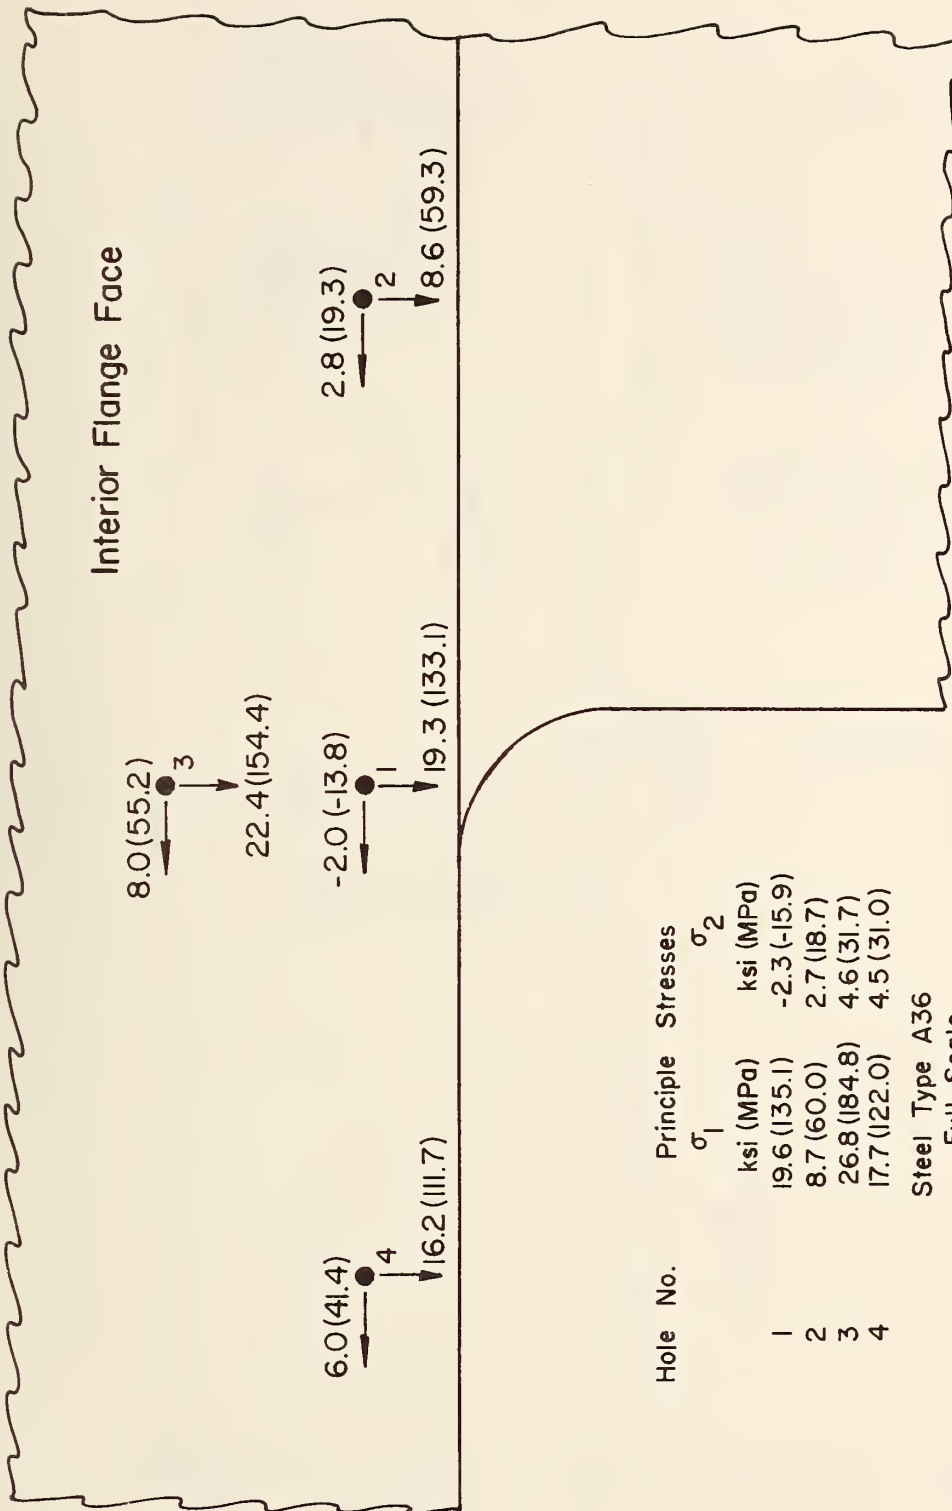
Groove Weld Lateral Attachment Surface Residual Stresses
